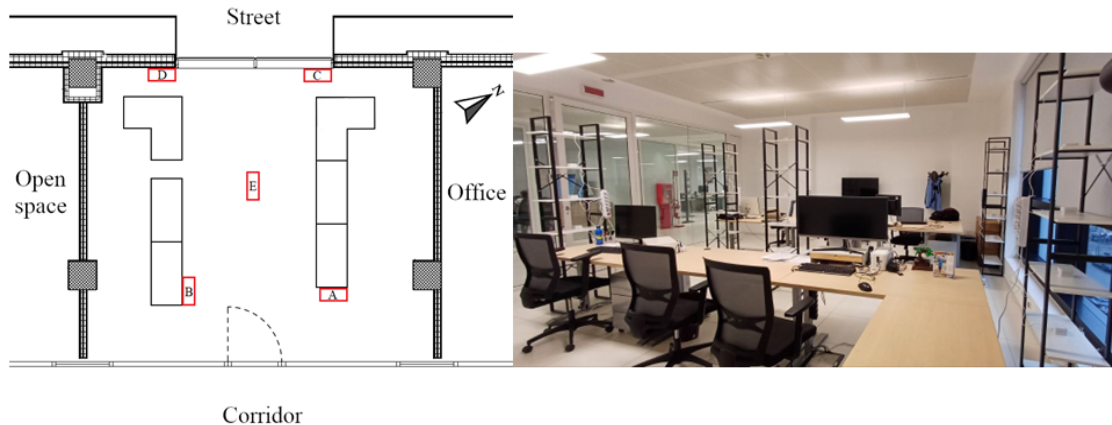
Left: Office floor plan with desks (black rectangles) and shelves (red rectangles). Right: picture of the room showing the shelves and multisensors set up.
